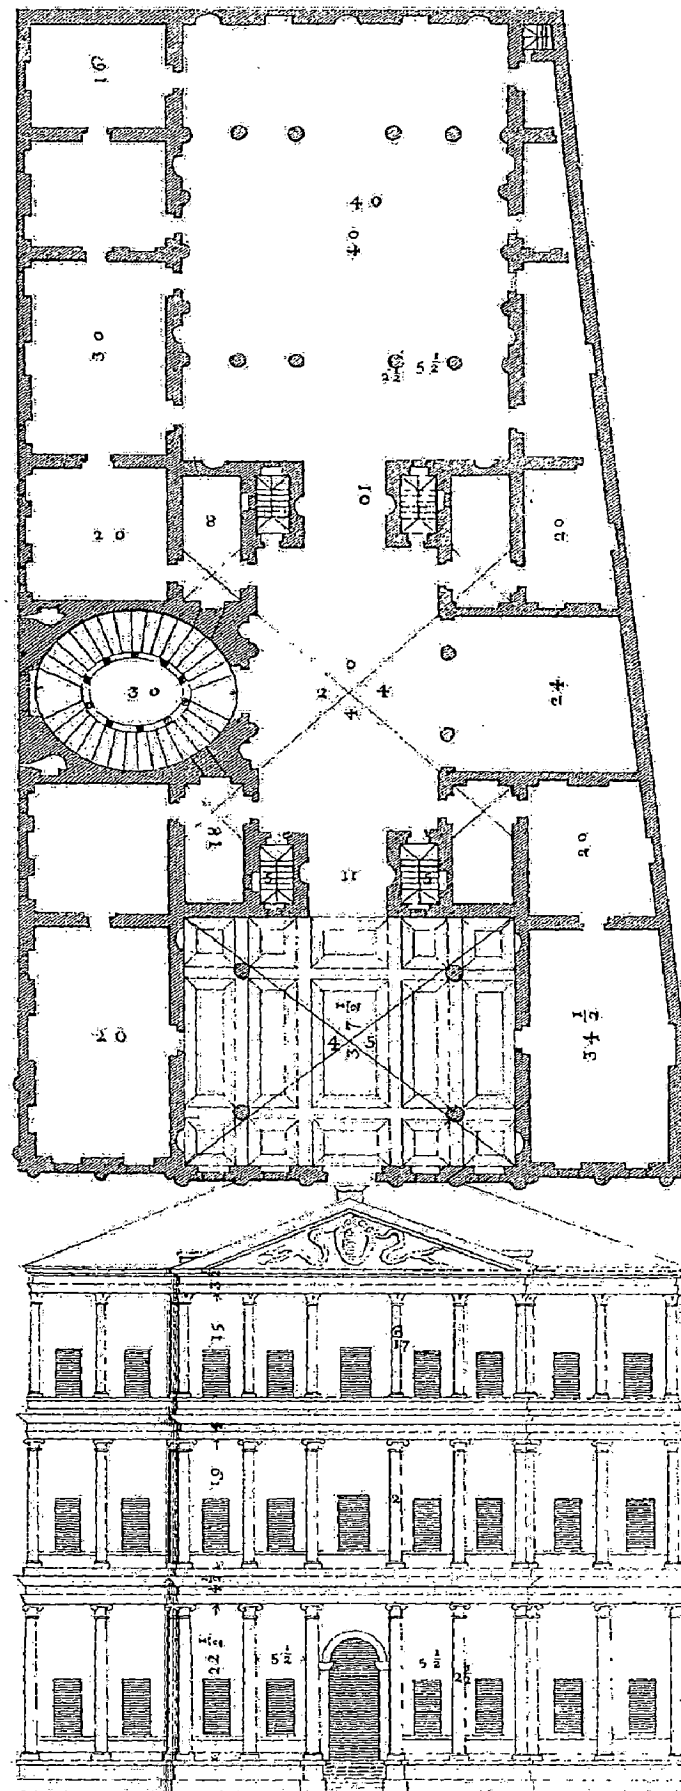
A project for a palazzo on a site in Venice in plan and elevation
